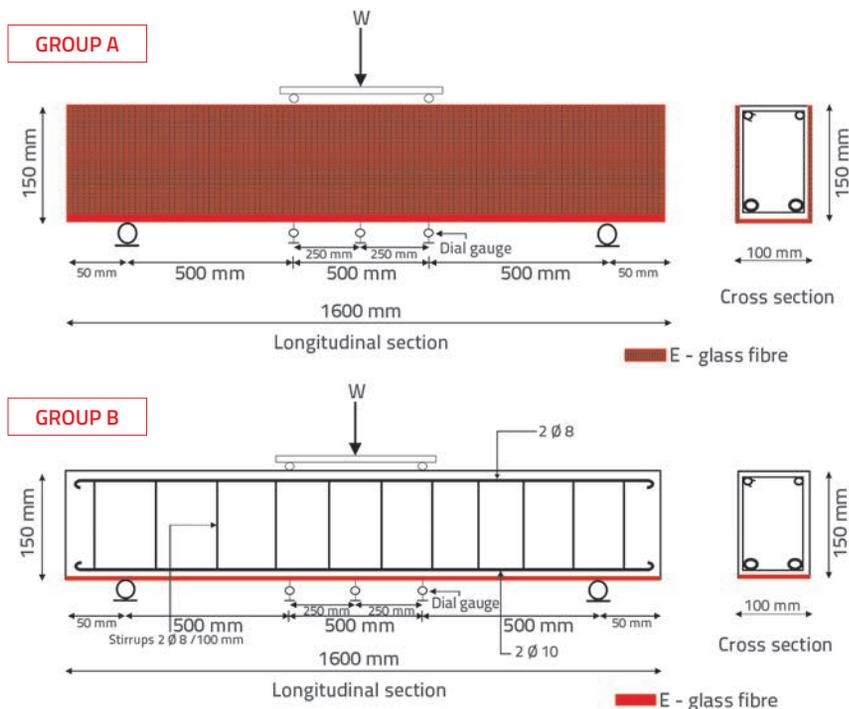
Specimen details: a) Group A beams - front view and cross section; b) Group B beams - longitudinal profile and cross section
